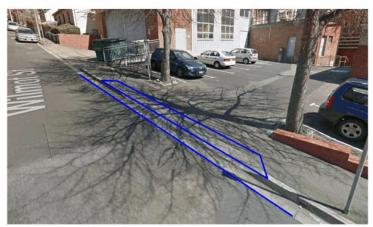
Existing Driveway on Wilmot Street to be upgraded and widened
